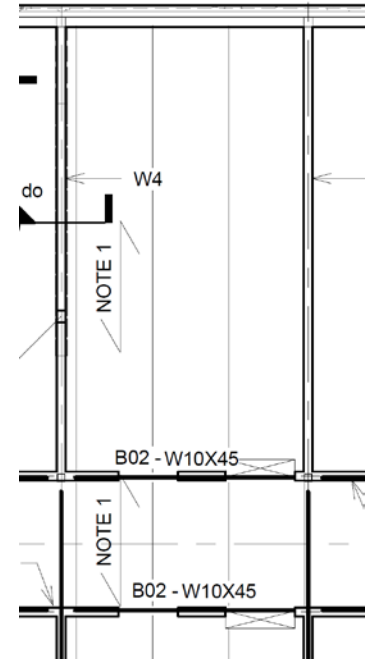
Typical first floor bay and corridor of 26 feet deep and 14 feet wide. (Plans S1.1A)
